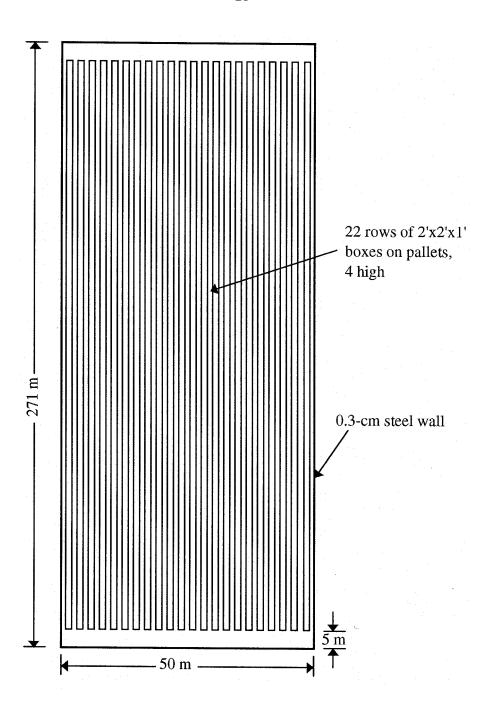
Plan View of a Storage Building with Storage Configuration
